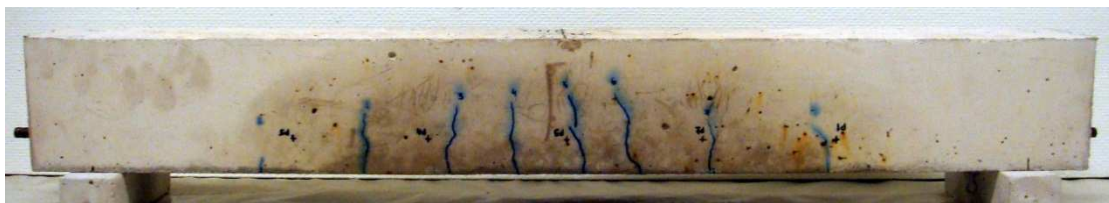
View of beam UF1 and crack patterns. First rebar is bar B.
